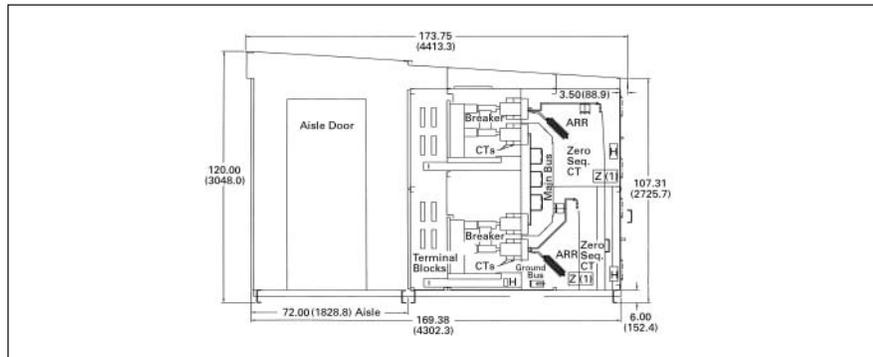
Outdoor Sheltered Aisle Single Row
